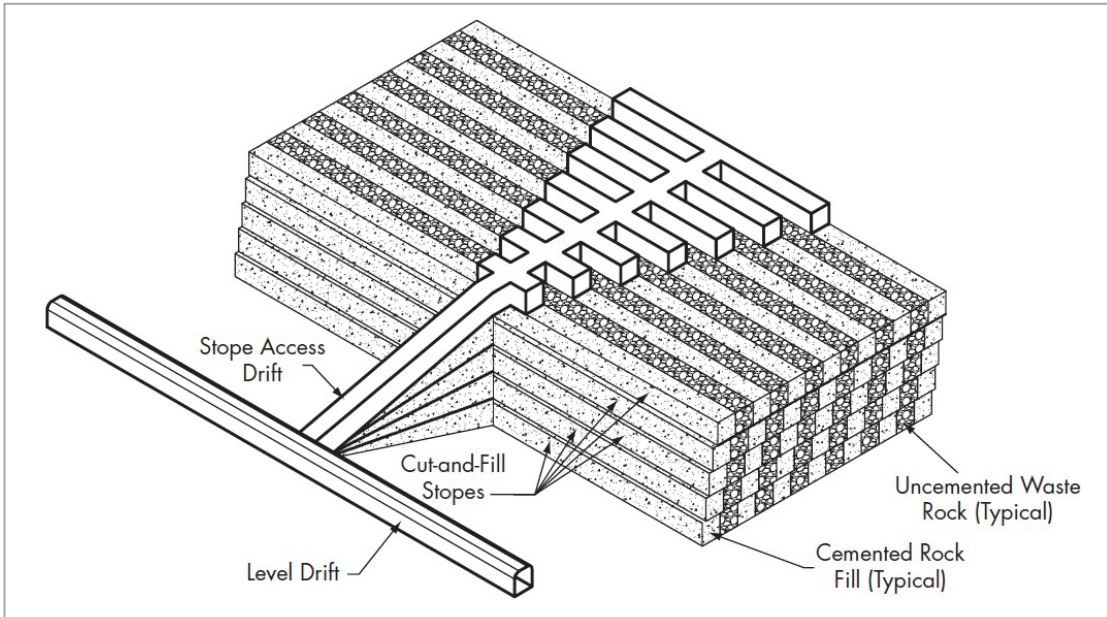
Typical Overhand Drift and Fill (SME handbook).
